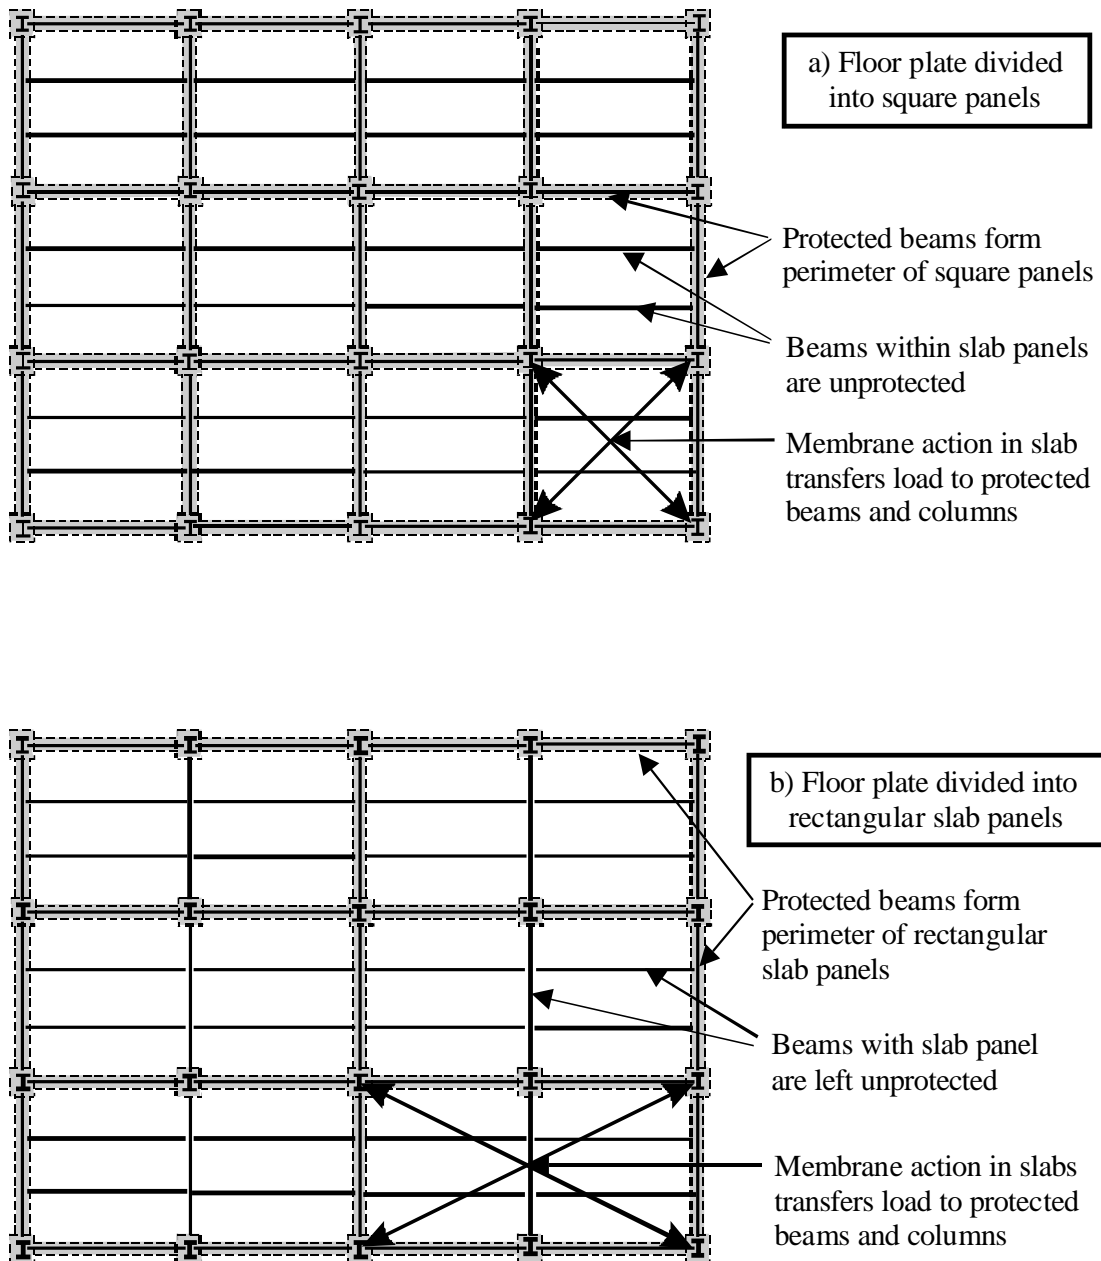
Two options for dividing the floor plate into slab panels to ensure membrane action in the floor slab during a fire.
